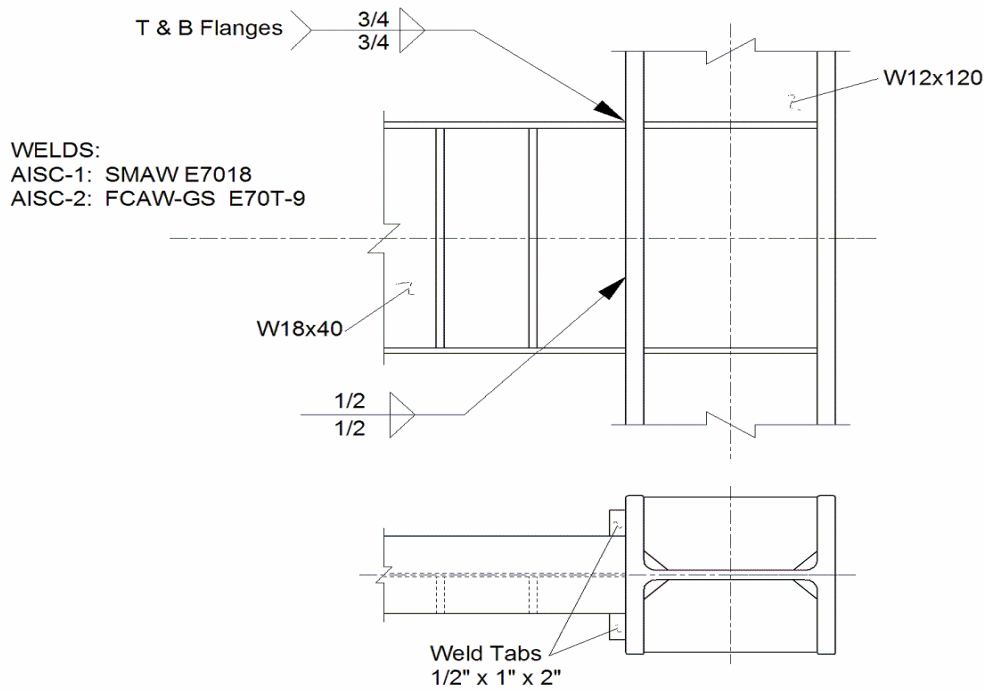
Specimens AISC 1 and 2 – Connection Detail
